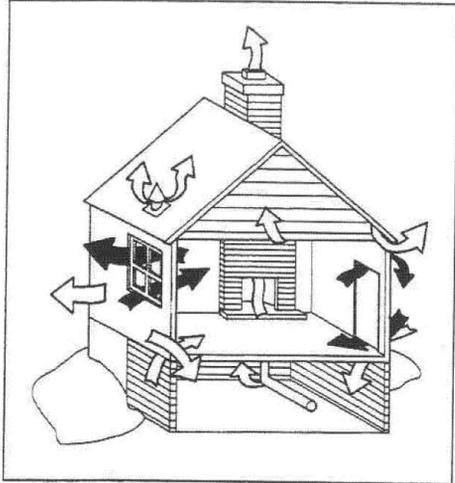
Typical leakage sites in a wood frame or light-gauge steel frame building.
